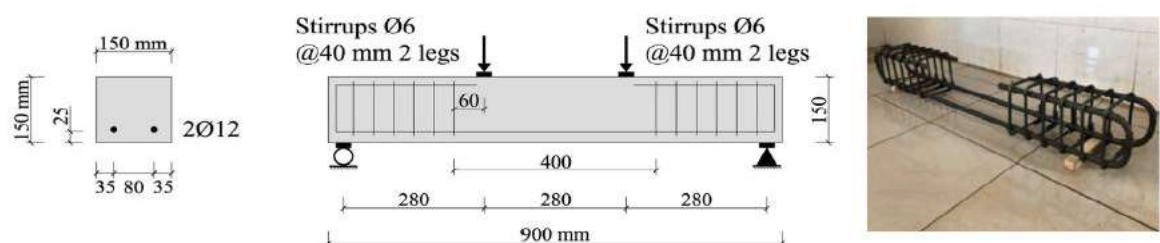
Geometry, reinforcement details and loading scheme of reinforced concrete beams with $\rho_s = 0.5\%$ and $\rho_s = 1.2\%$
